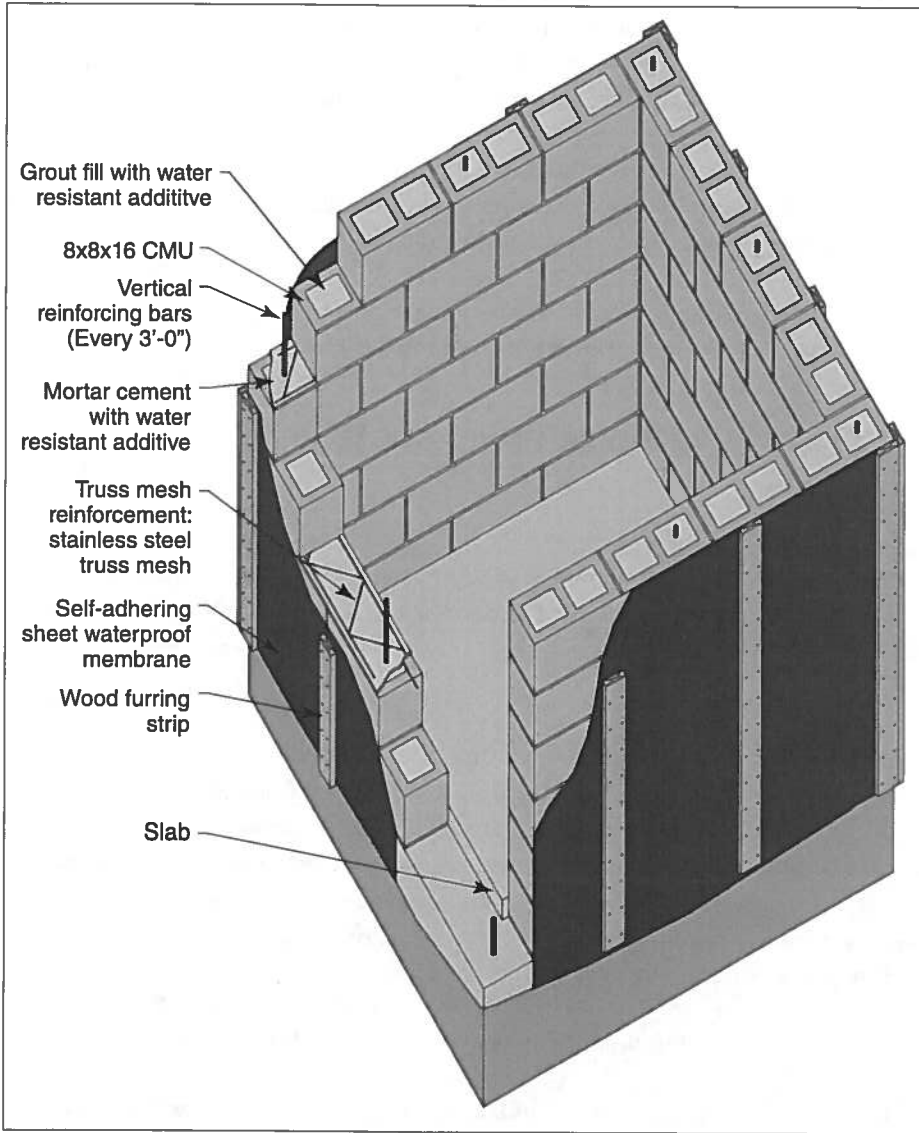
Cross section of the test mock-up used for the SERRI tests of a substantially impermeable CMU wall system (SERRI Report) – Not intended for design purposes
